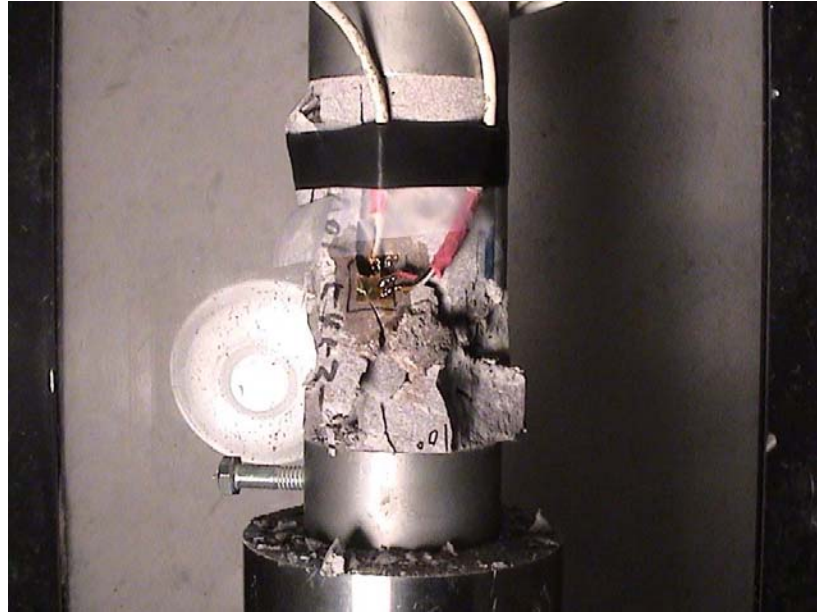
A specimen can be loaded again after failure (Specimen ID: 01015453-U).
